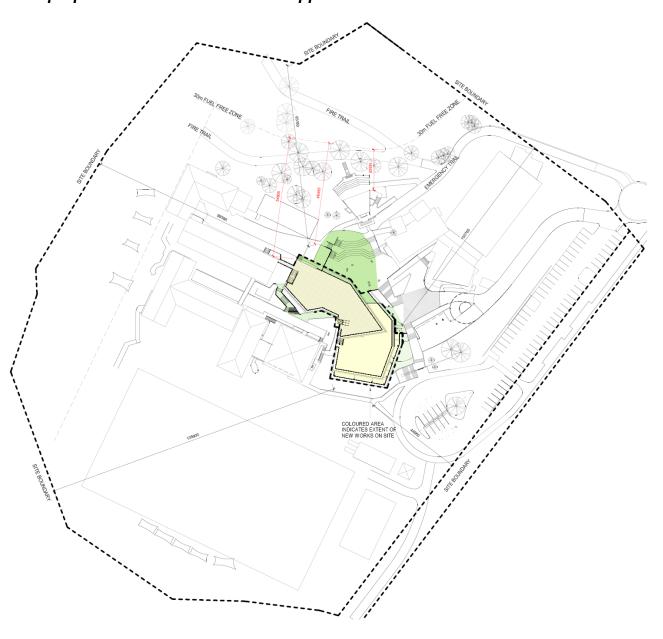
Part Overall Site Plan showing existing buildings and the building proposed under the Section 96 Application.
